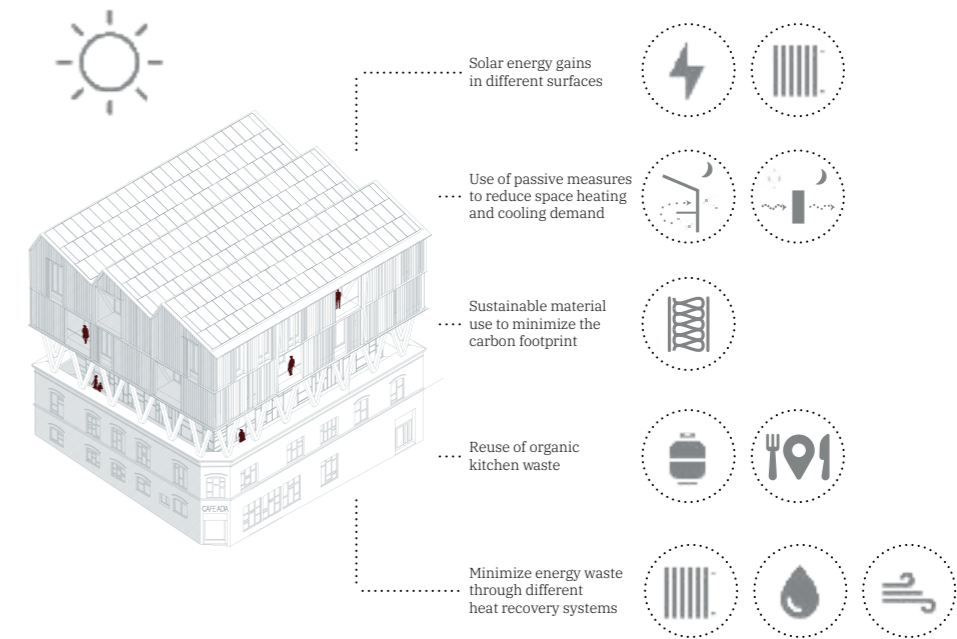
1. Concept of the RoofKIT whole building approach with its main innovations
